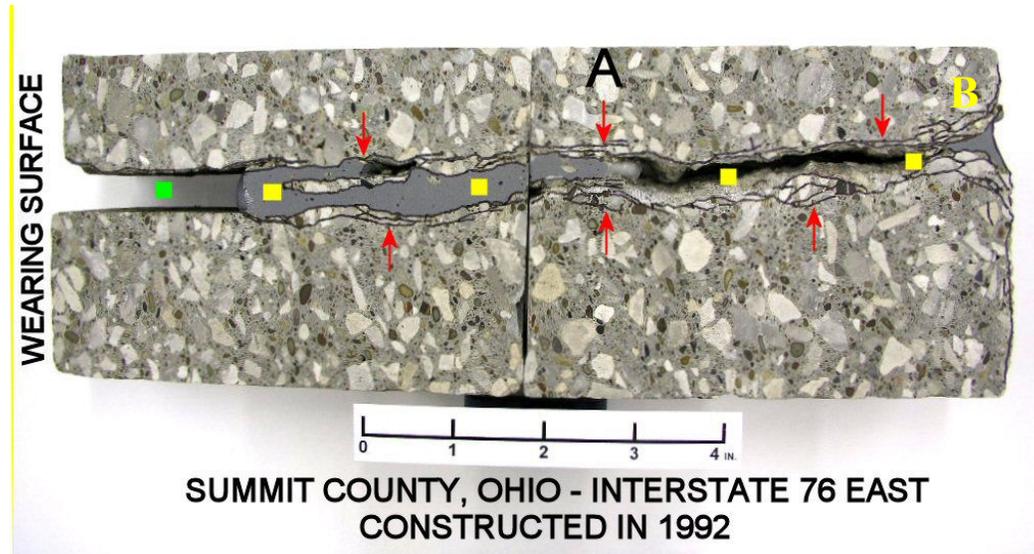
Lapped surface of the joint core taken from Interstate 76 East in Summit County, Ohio, showing sub-surface cracking and spalling distress.
